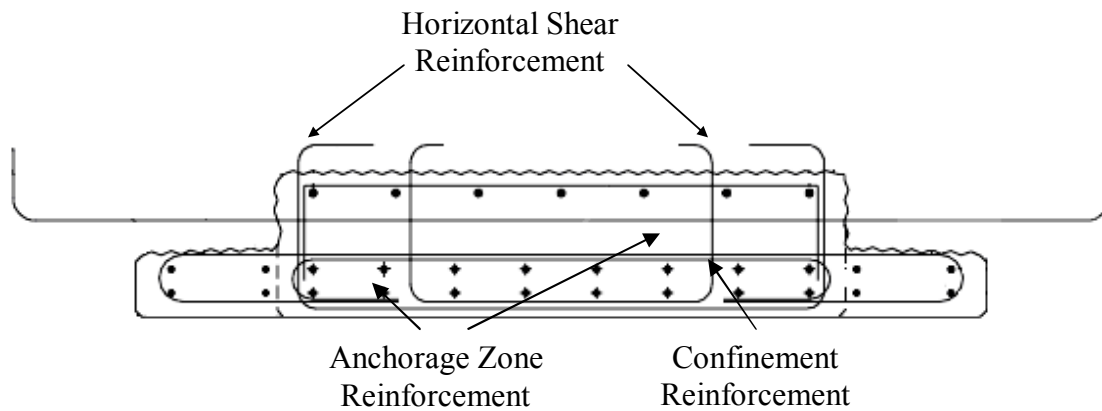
Cross-sectional view of an interior inverted-T precast section detailing transverse reinforcement within the precast sections
